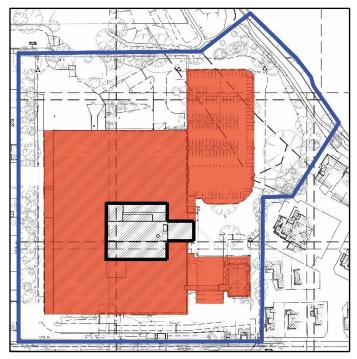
Plan of the existing site, the Former Bushells Factory Building core is outlined in black. (Source: Colliers International)
